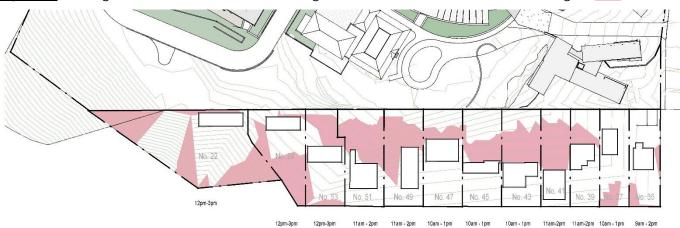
Proposed Site Conditions – Winter Shading – External Area with 3 hours Natural Light
